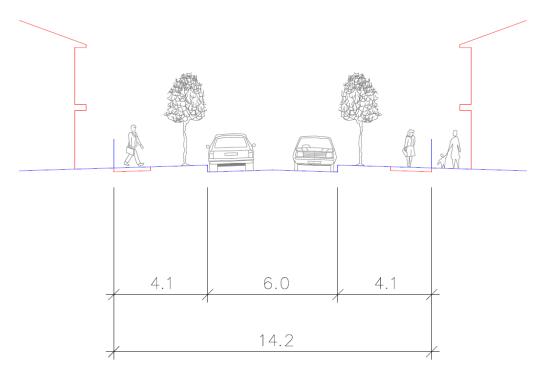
Typical Cross Section for a 14.2 m Access Street D
